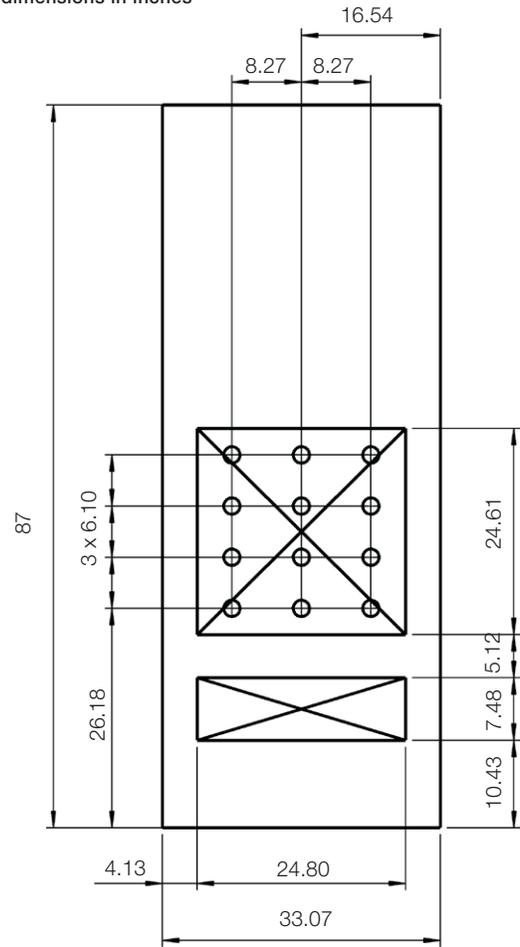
Panel for capacitor switching ZX2-C, dimensions in inches
